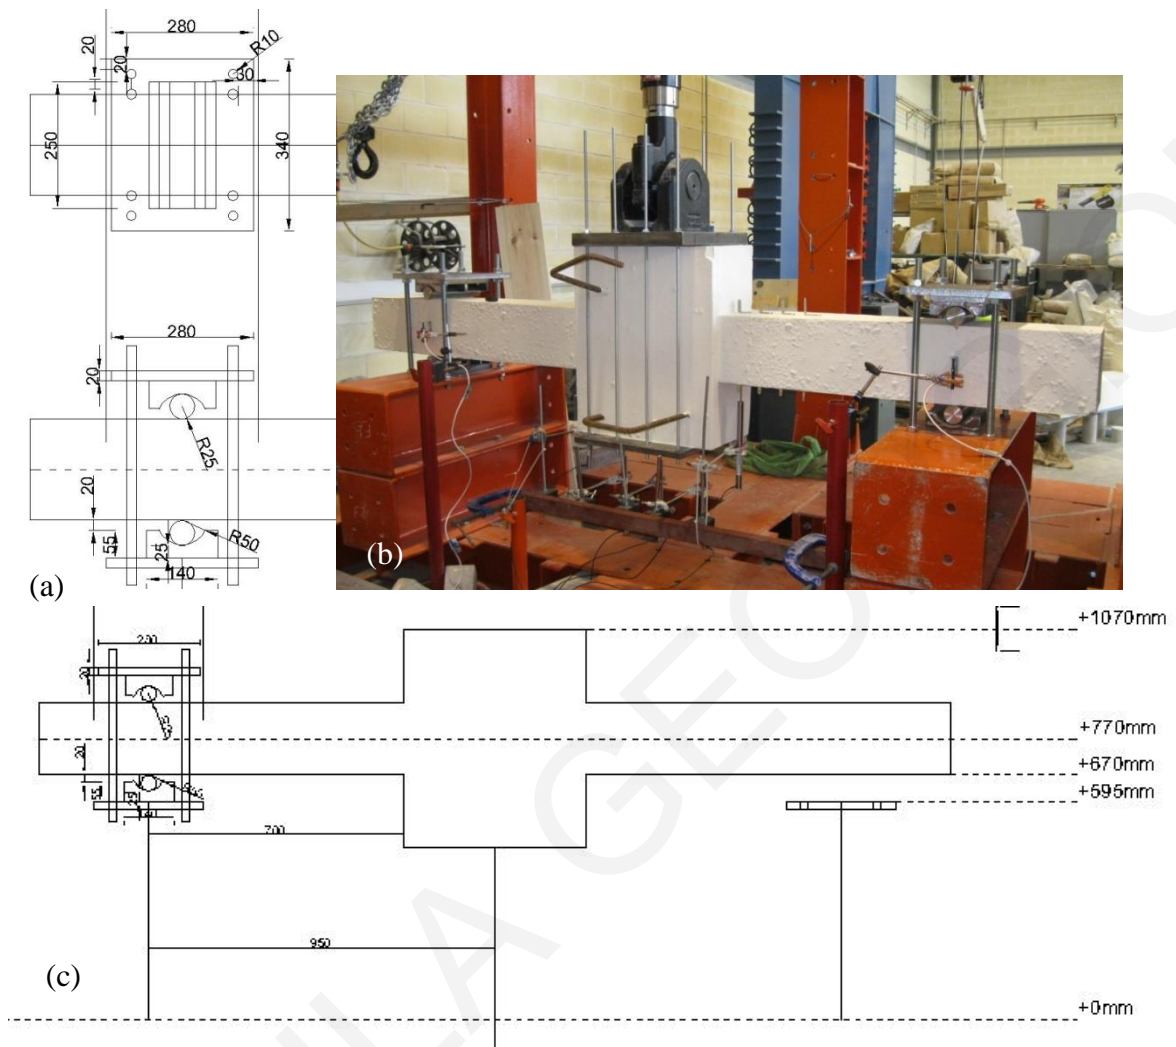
(a) Roller support design, (b) Beam setup photo and (c) Setup distances
